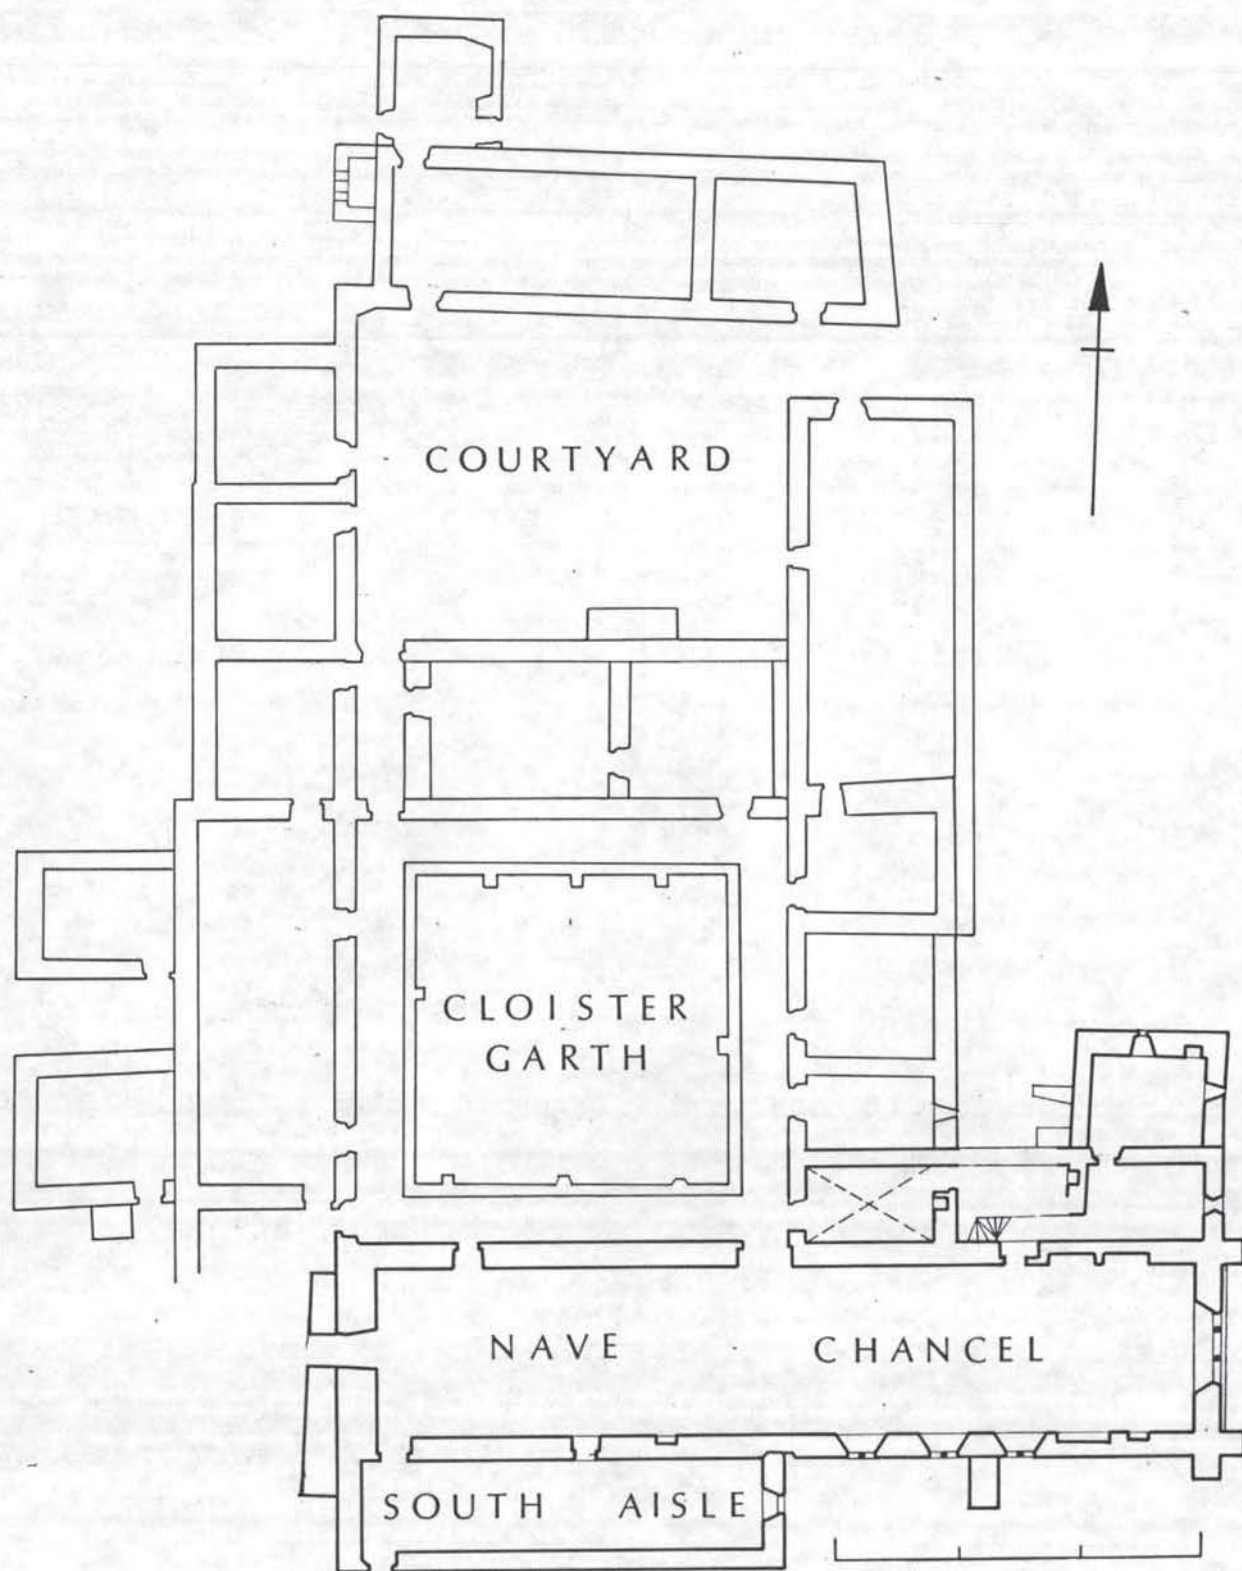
Templemurry Church, Rathfrán, ground plan.
